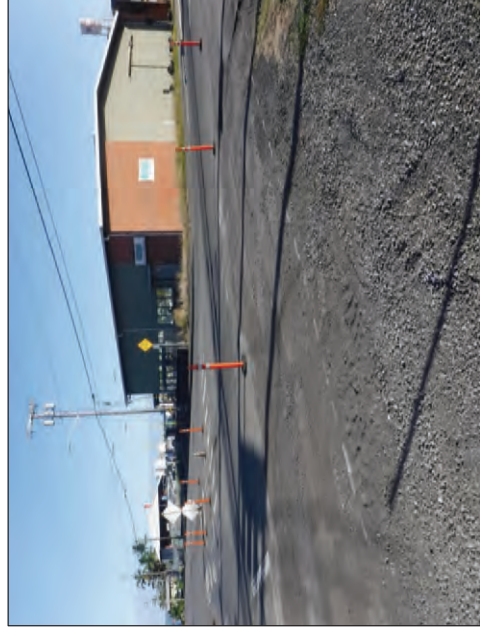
Airgas Gaspro parcel, TMK (3) 2-1-007:005, with entrance to Kūmau Street (left-side of photo). View to the North.
